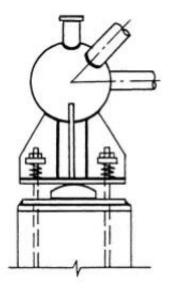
Sketch showing the Bearing joint resting on curved bearing block 125
